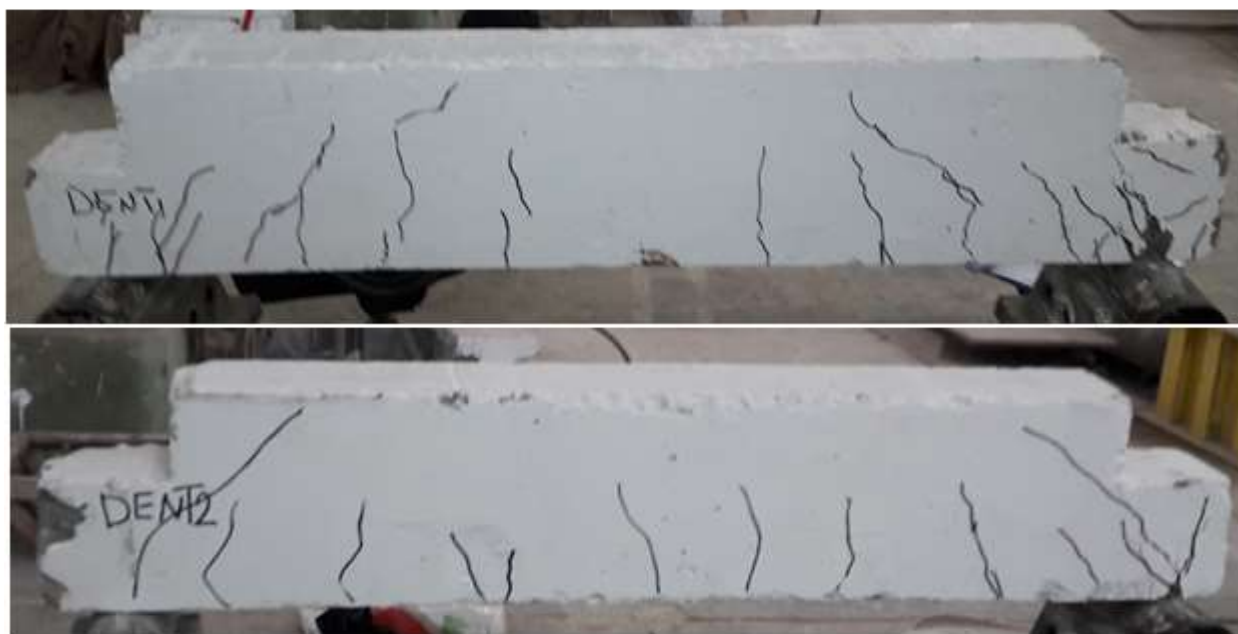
Crack pattern of R.C. inverted dapped-ends girders.
